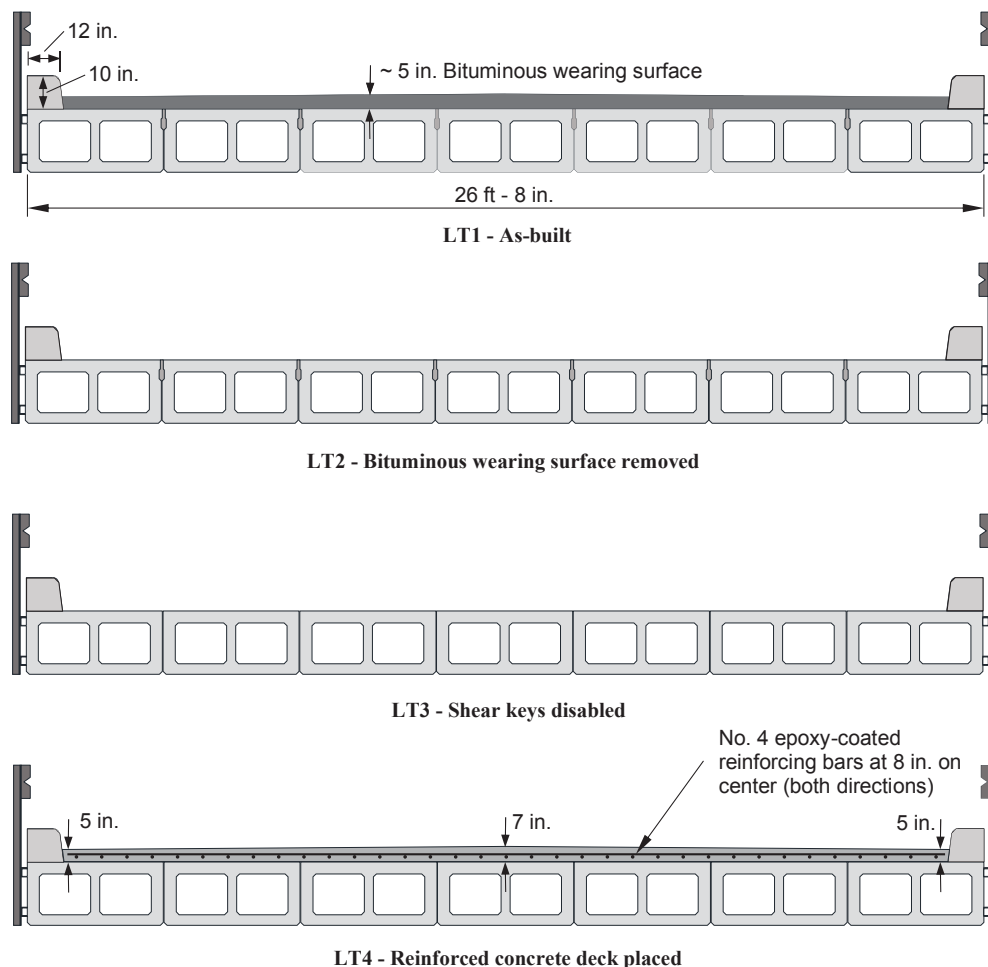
Load test bridge conditions. Note: LT1 = load test 1; LT2 = load test 2; LT3 = load test 3; LT4 = load test 4. No. 4 = 13M; 1 in. = 25.4 mm; 1 ft = 0.305 m.
